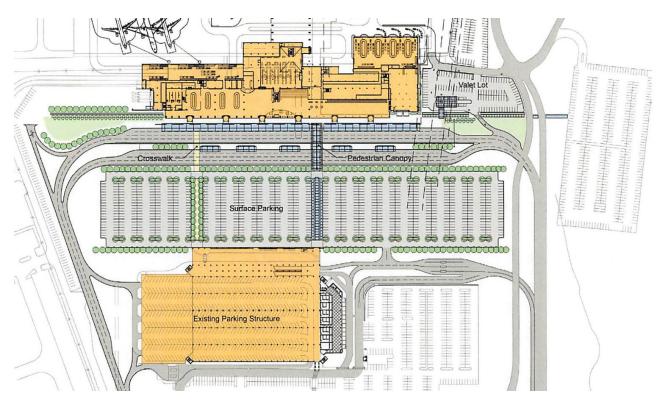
Landside configuration following opening of Arrivals Hall – Surface Parking
